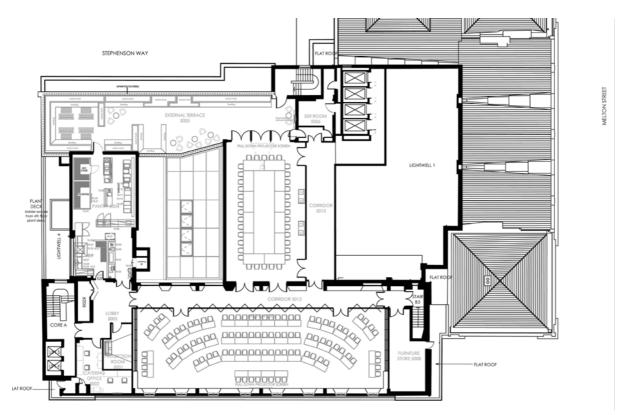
5th floor plan of the RCGP building showing the existing roof terrace and access arrangements, *CBP*.
